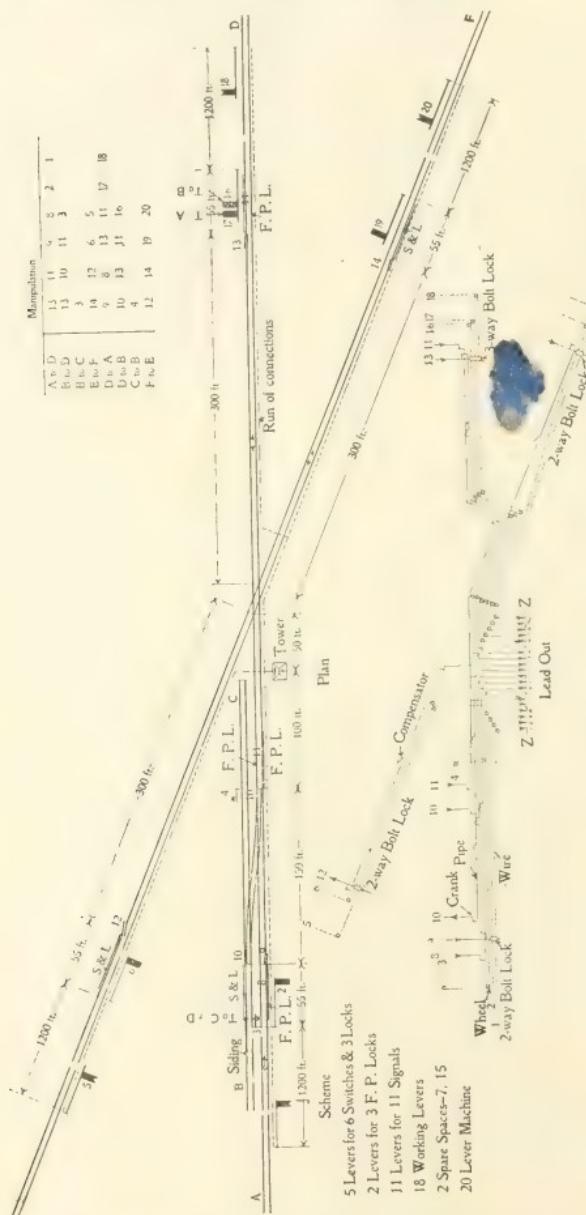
TYPICAL RAILROAD CROSSING PROTECTED BY A MECHANICAL INTERLOCKING PLANT
